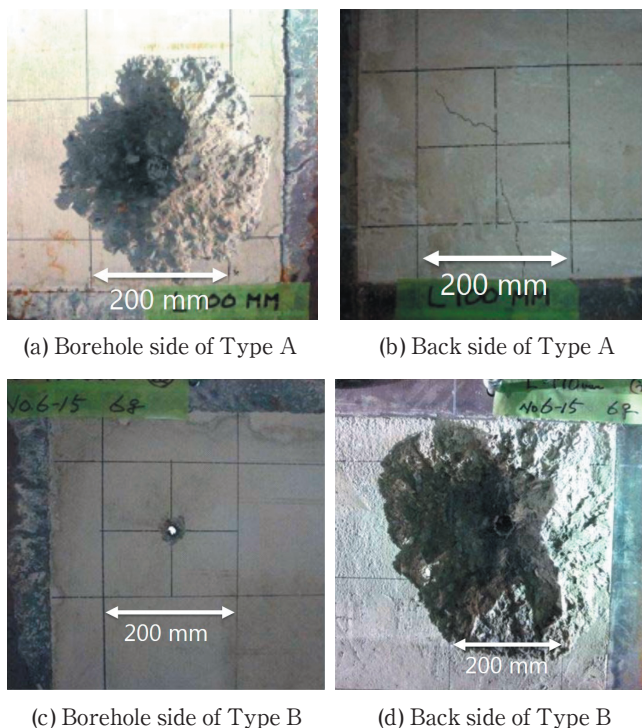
Result of the single-charge experiments. Amount of explosive : 6.0 g
